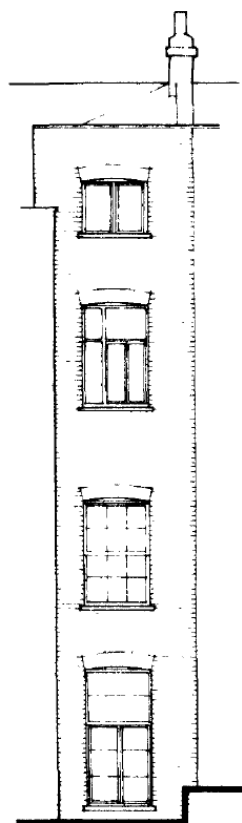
Existing rear elevation of no. 17, 1994. Camden planning ref: HB/9370268.
